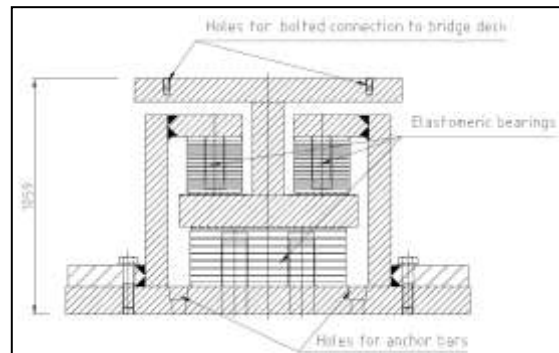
Cross section of pre-compressed uplift bearing. The elastomeric pads have PTFE surfaces (bottom of upper pads, top of lower pad) to allow sliding of the upper part across the lower part.
